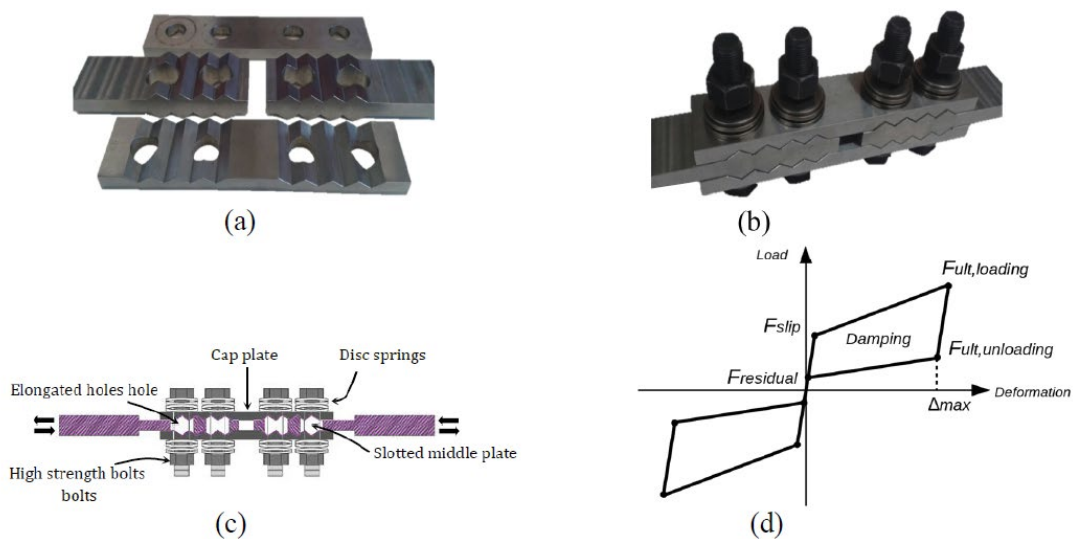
RSFJ: a) sliding plates, b) assembly, c) components, d) flag-shaped hysteresis
